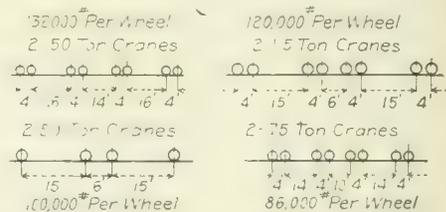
Spacing of Wheels and Wheel Loads of Heavy Cranes Serving Open Hearth Building of Pennsylvania Steel Co.
